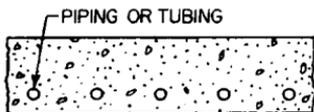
Pipe embedded in a concrete slab for radiant heating.
